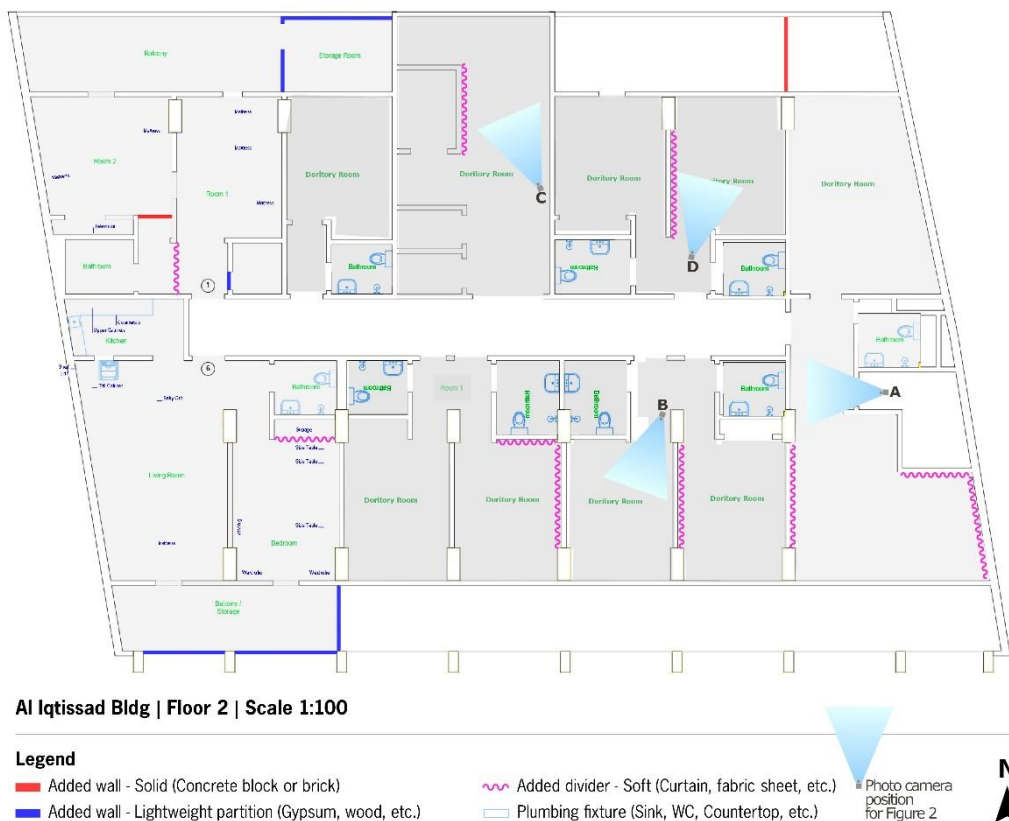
Type 1 floor plan unit showing empty apartments where workers modified walls and plumbing (Marinovic's Archive, 2026).
